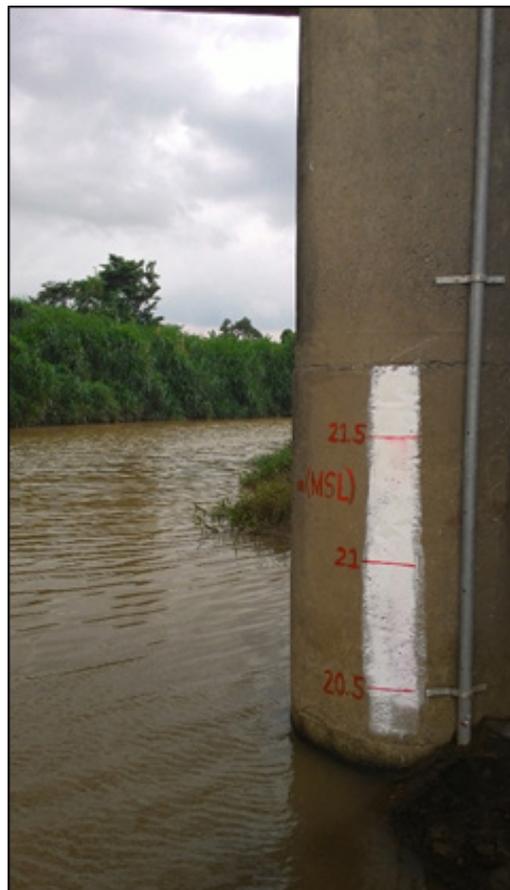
Water level markings on the side of the pier in the Cañas Bridge
